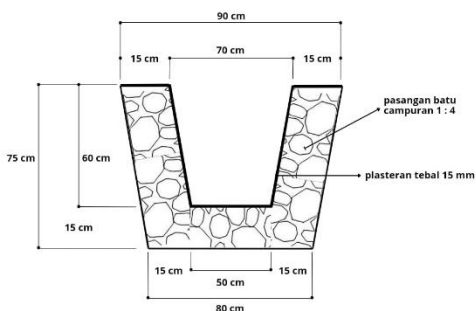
Drainage Design The drainage construction plan along the road connecting Balunijuk Village to Jada Bahrin Village is 2600 M or 2.6 KM long. This drainage construction plan is made on both
